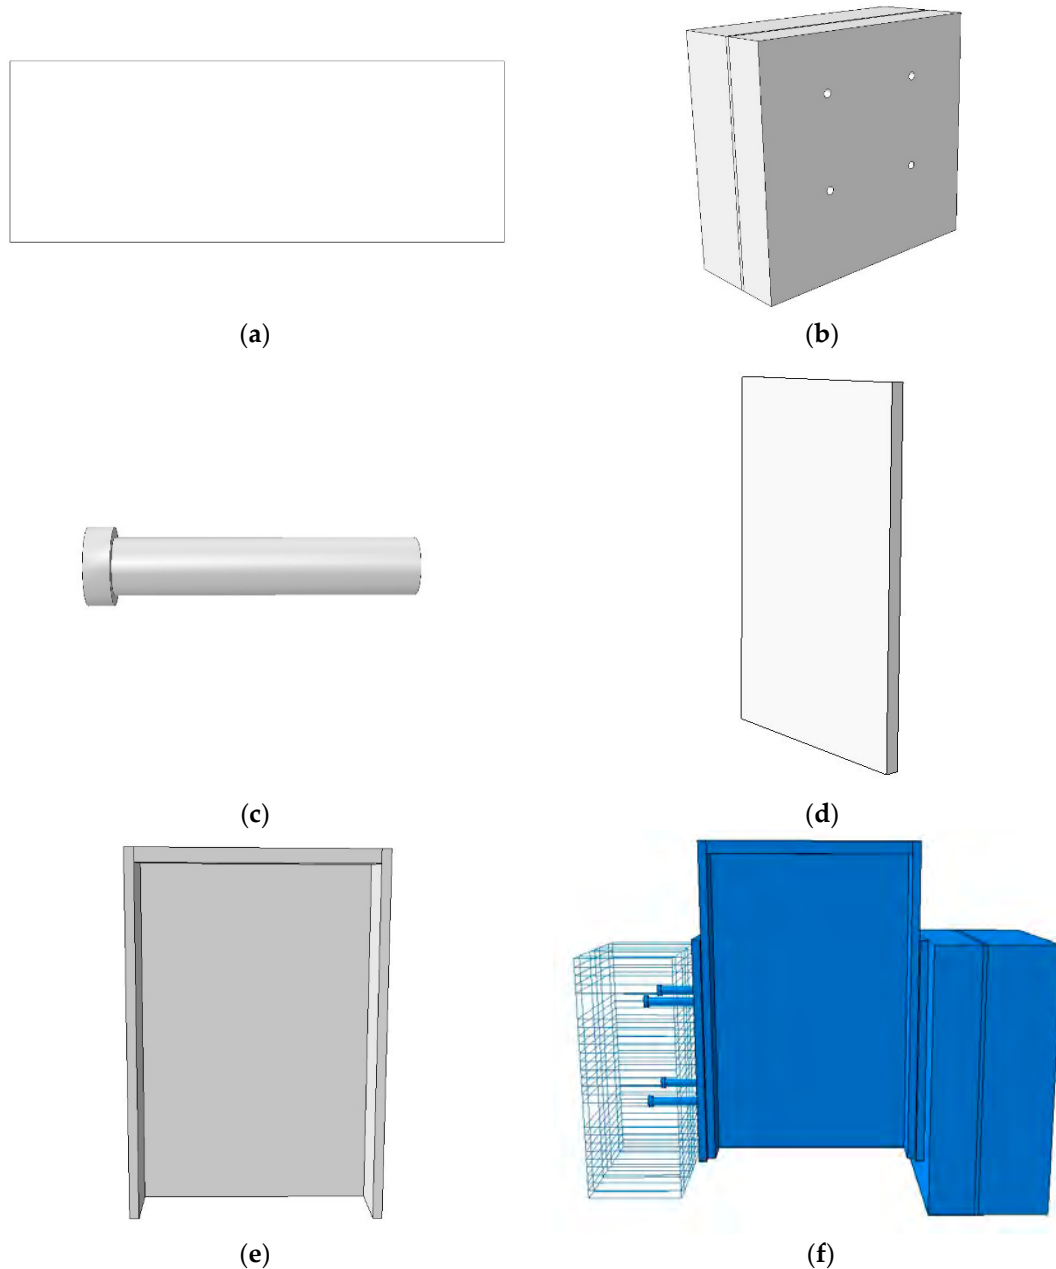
The considered FE model with its parts: (a) steel reinforcement bar; (b) concrete; (c) steel studs; (d) steel plate; (e) steel beam; (f) full model.
